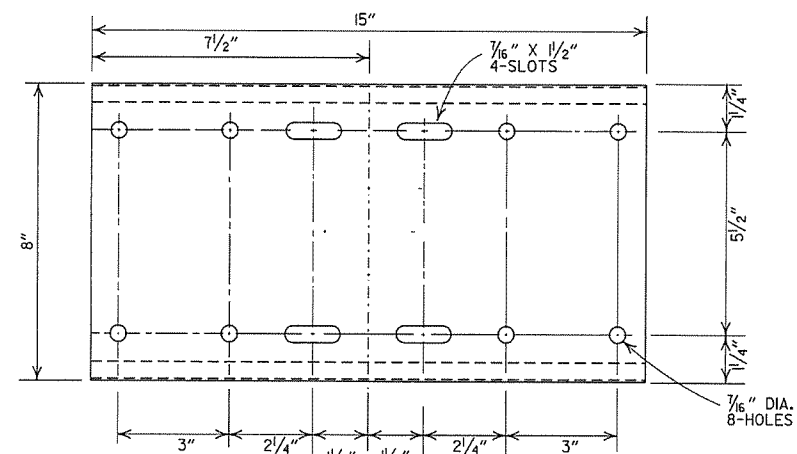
DETAIL OF TERMINAL ANCHOR POST (TYPE I)
